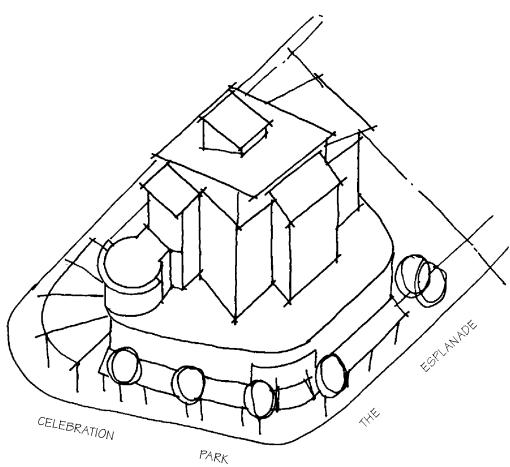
Kings Beach Shop Key Site Design Acceptable Solutions.
